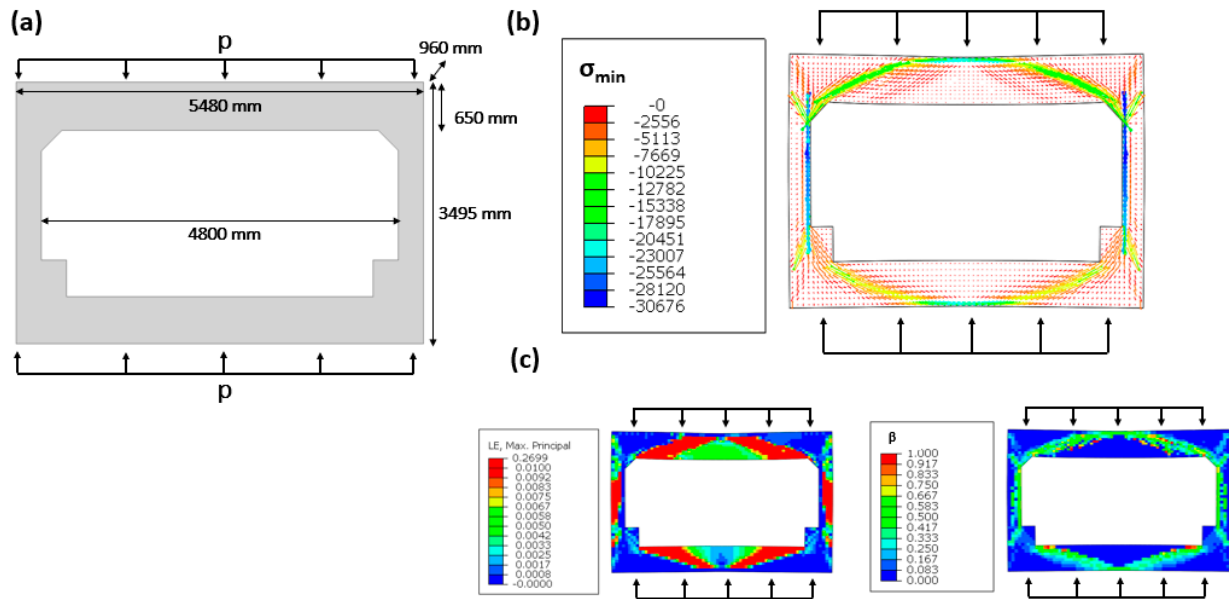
Example 3: RC tunnel section tested by [27]: (a) Geometry and loading; (b) Compressive stresses at failure; (c) Damage pattern at failure.
